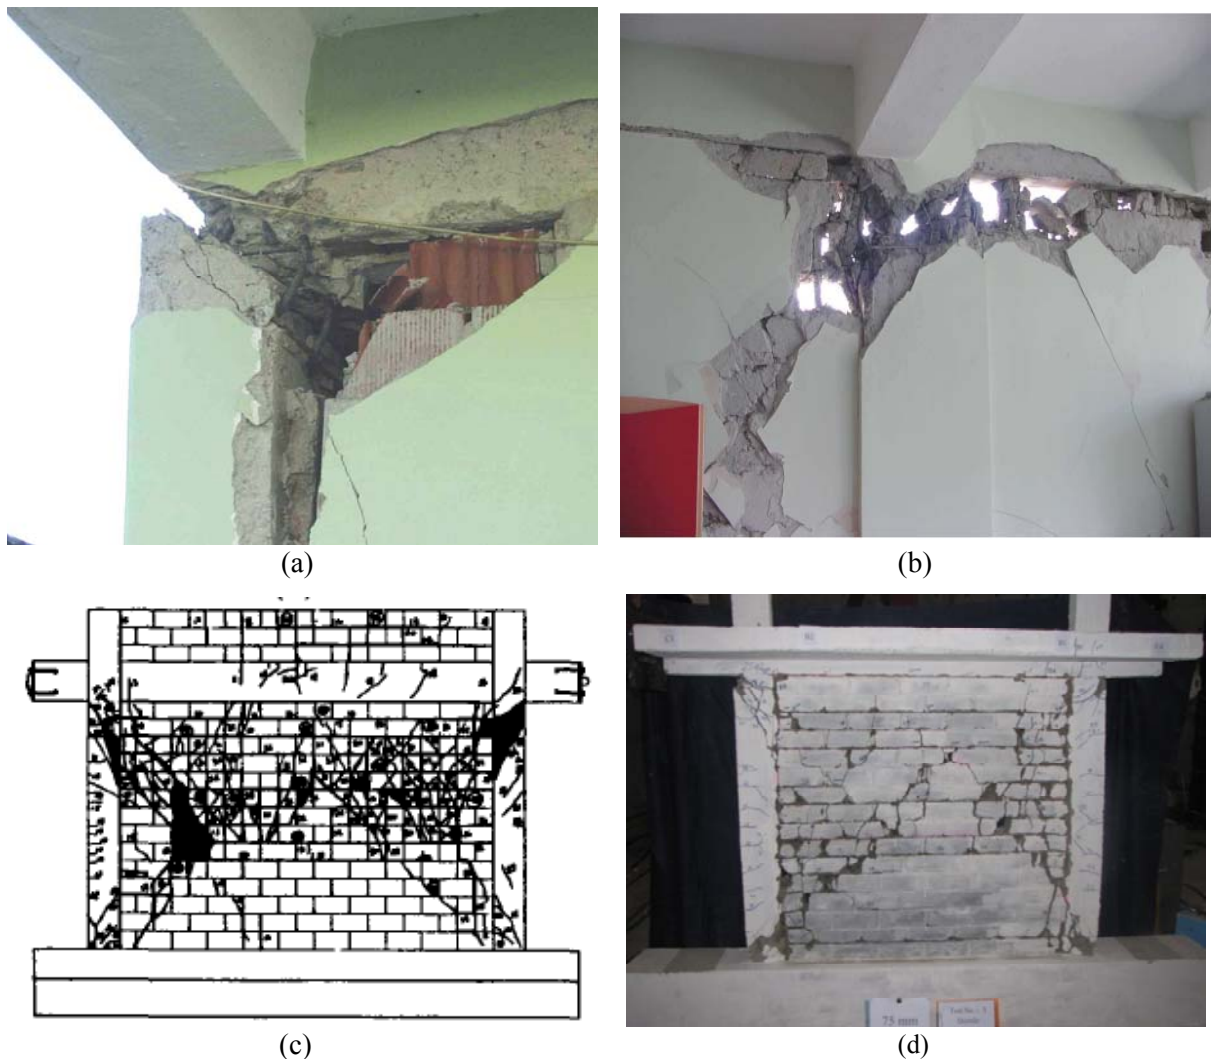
Shear failure of RC columns caused due to strut action of masonry infill: (a) failure of exterior column, and (b) failure of interior column observed in 2003 Bingöl earthquake (Özcebe et al. 2003); (c) column shear failure in experimental study (Mehrabi et al. 1996); (d) column shear failure due to strut action combined with bed-joint sliding of masonry infill (Kaushik and Manchanda 2010).
